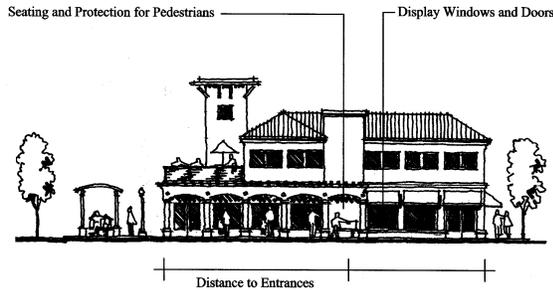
B(1) - [Downtown / Main Street] Building Design Elements (Typical)
